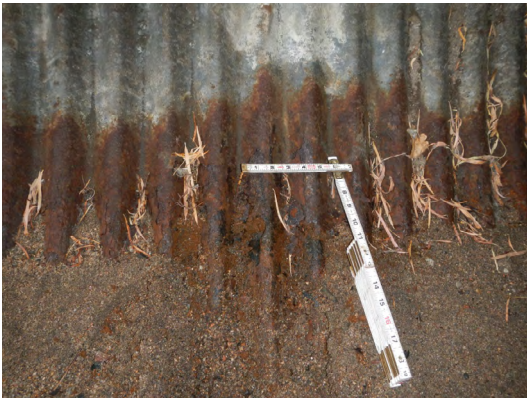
Bridge J-15-G – Corrosion inside Pipe
